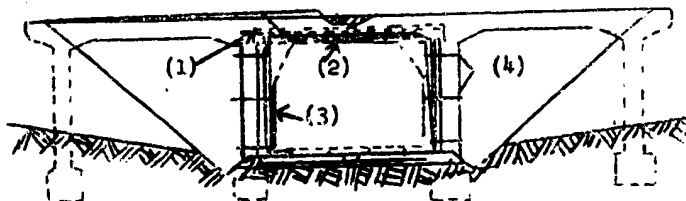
Temporary Repair of a Damaged Reinforced-Concrete Viaduct
